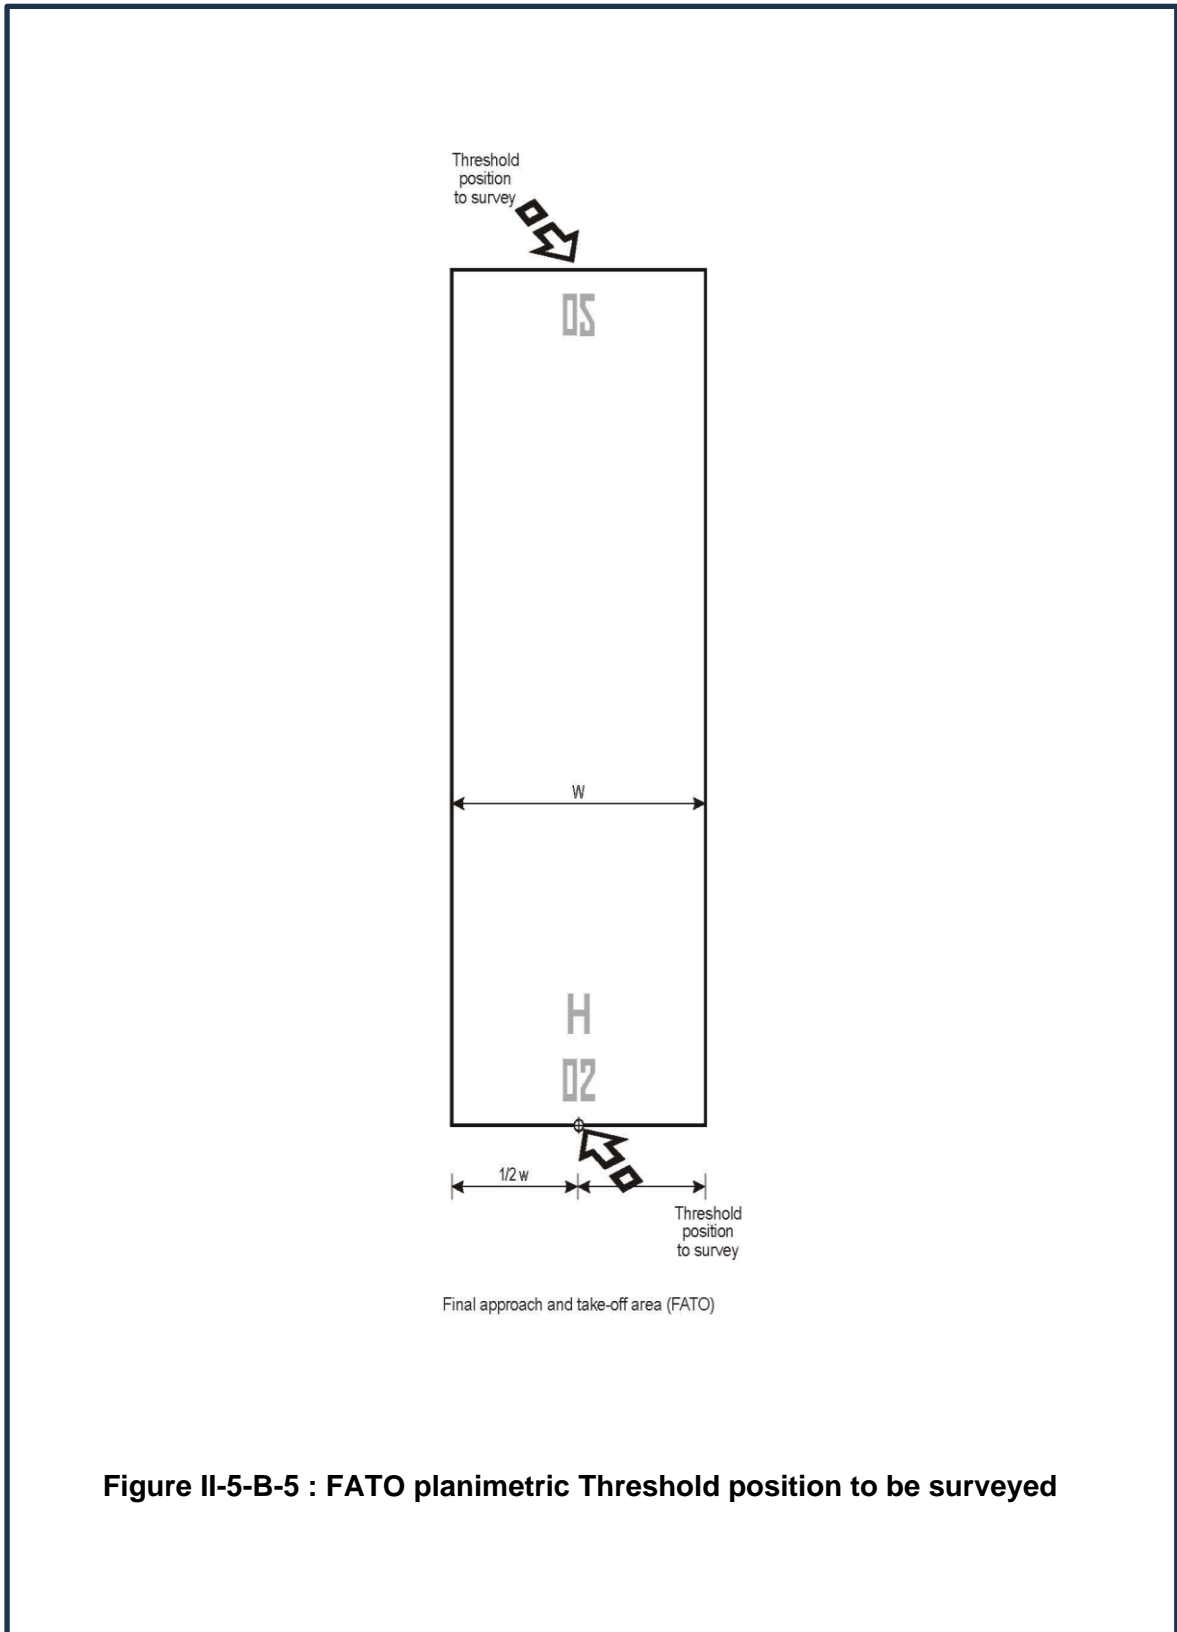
B-5 : FATO planimetric Threshold position to be surveyed
